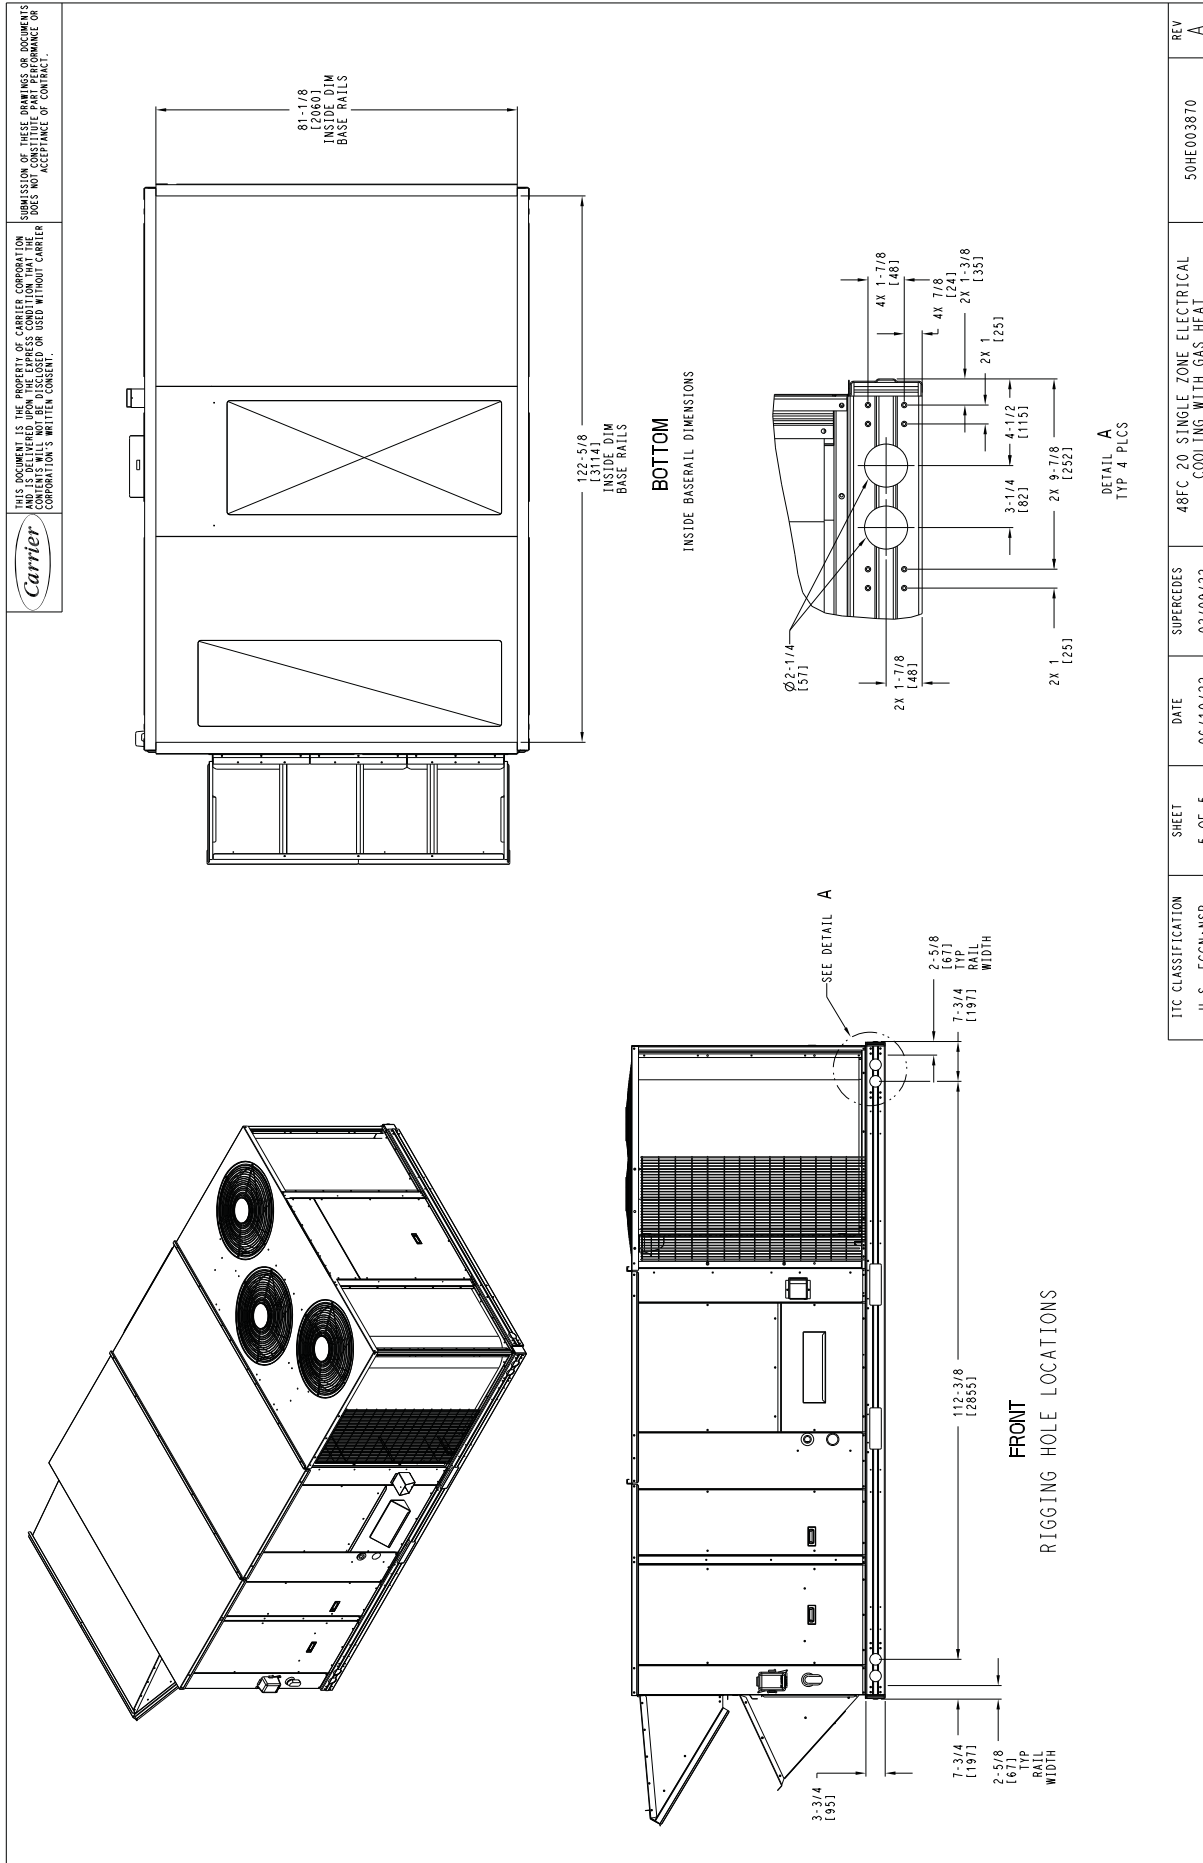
48FC20 Base Unit Dimensions (cont)
